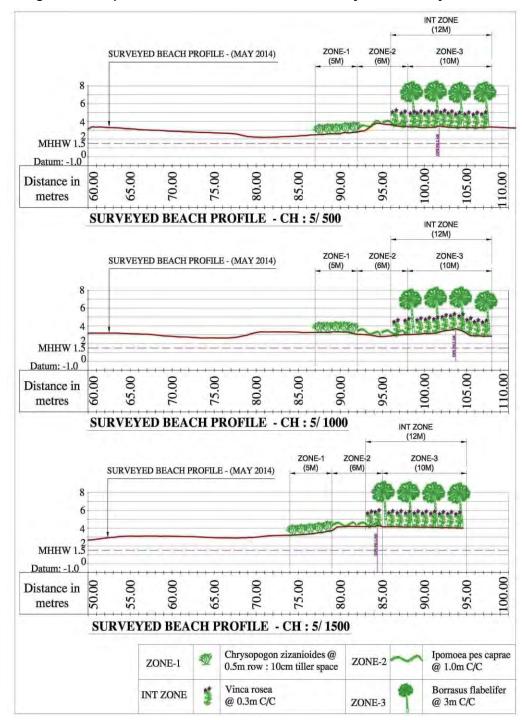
Proposed Plantation Scheme at Kodi Kanyana Sub-Project Site
